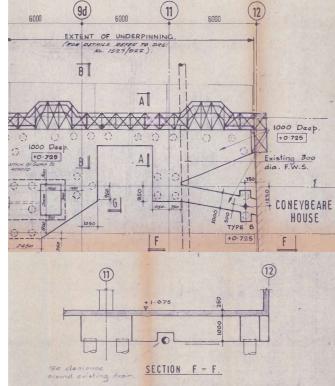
Sewer location below Keats House as shown on Engineer's plan section F-F
